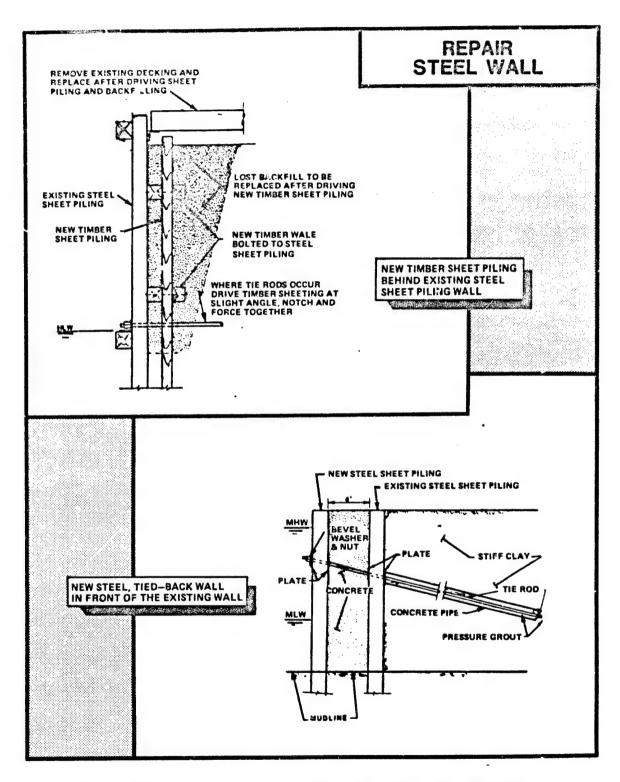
Replacement of Existing Steel Sheet Pile Wall with New Steel Sheet Piling or Timber Sheet Pile Wall.
